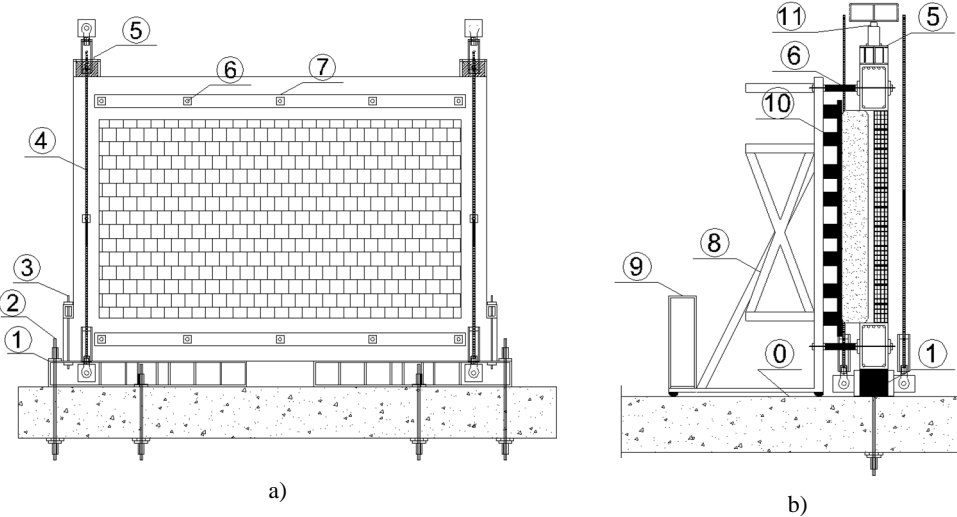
Tests with uniform loading: Test setup, a) Front View; b) Lateral view schematic layout. 0 - strong floor, 1 – foundation steel shape, 5 – steel cap, 6 - steel rods (ø20mm) connecting the RC frame and the reaction structure, 8 - self-equilibrated reaction steel structure, 9 – counterweight, 10 – wood bars, 11 - hydraulic jack (for axial load application).
